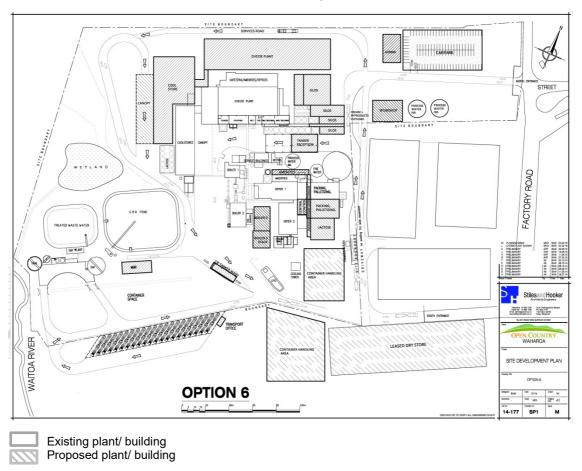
Site Plan showing Proposed additional Plant and Buildings
